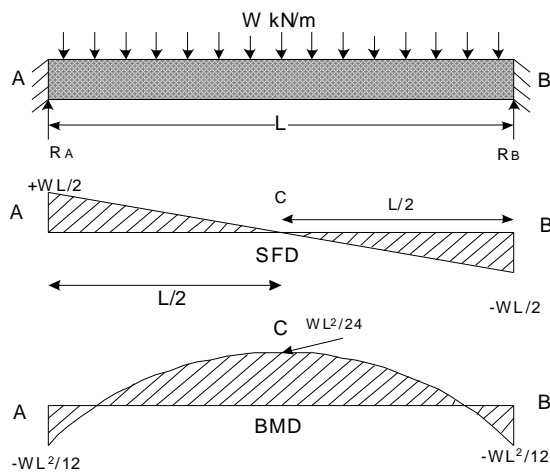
Fixed Beam with Uniformly Distributed Load Over Entire Span^[1]
